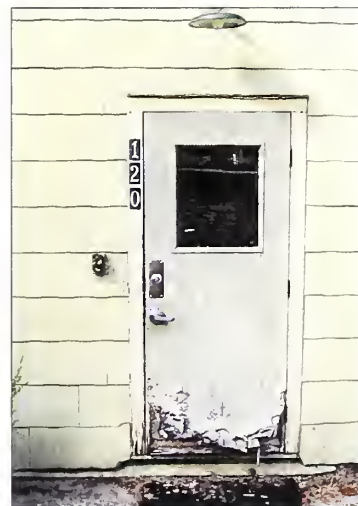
This door looks like an interior door that was mistakenly installed on an exterior wall. It is badly deteriorated and should be replaced with an exterior door.
